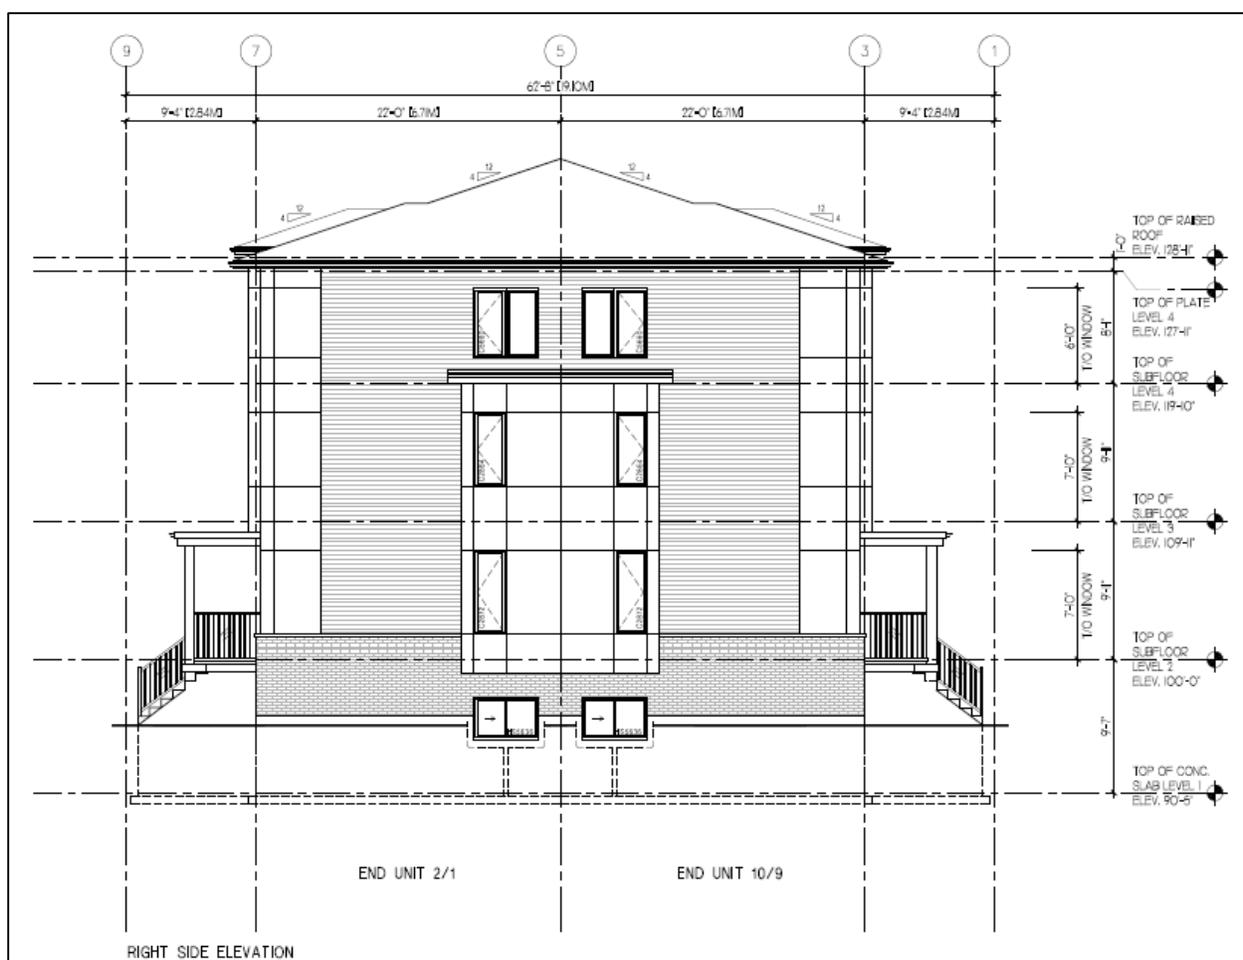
Right Side Elevation Block A - 279 Samia Road.
